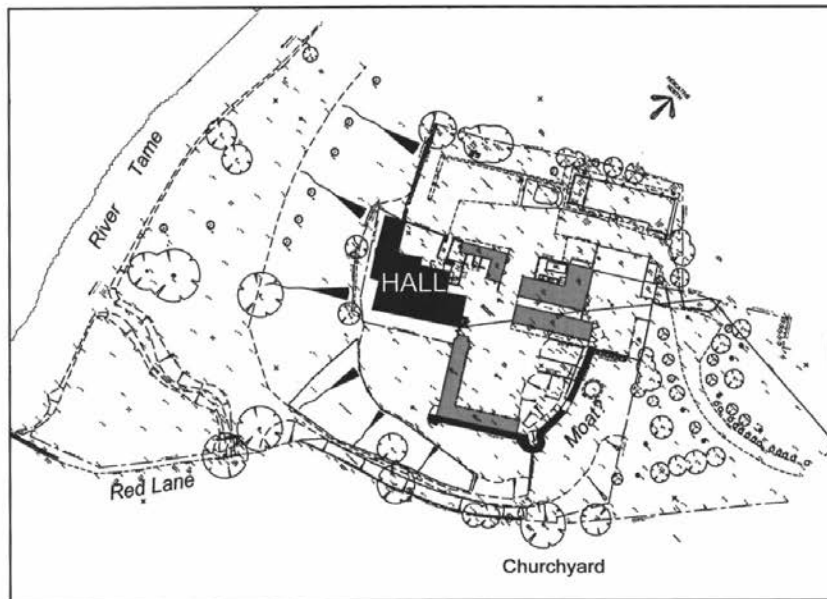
Modern site plan of Kingsbury Hall (approximate scale 1:1500)
